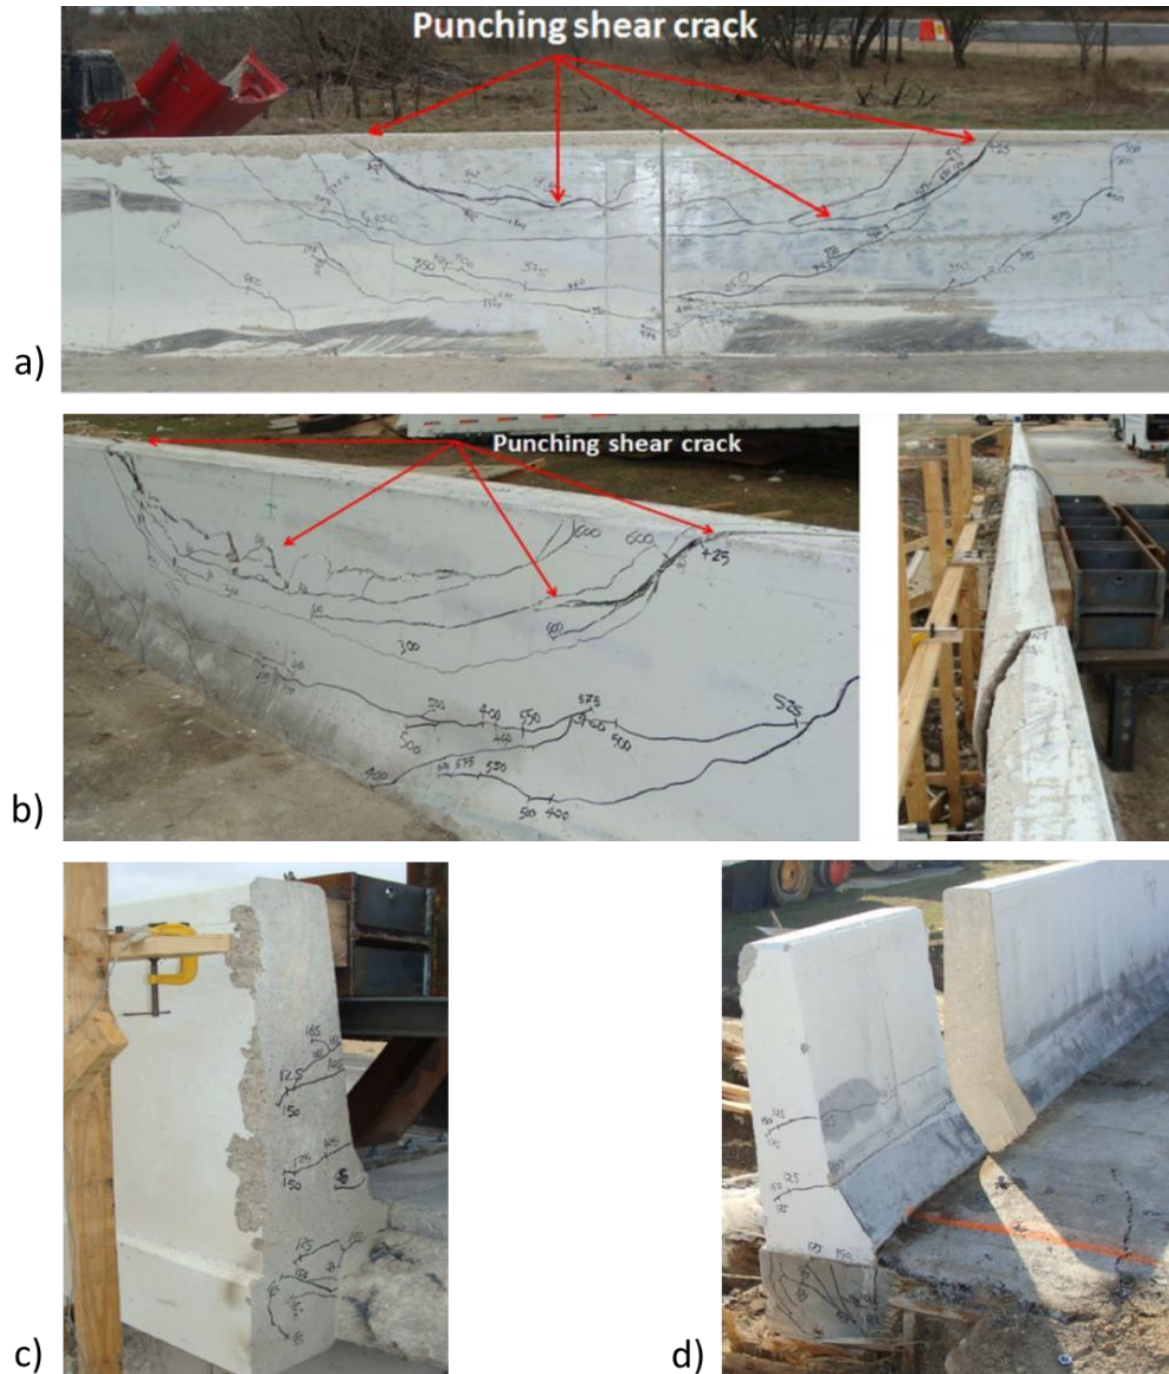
Details of the Tests 2-5: a) failure of the barriers loaded at expansion joint, b) front and top view of the crack pattern at ultimate load for the barrier loaded at middle, c) crack pattern at ultimate load at the section of the 39.4 in long barrier and deck system in the middle of the specimen, and d) failure of the 39.4 in long barrier and deck system at the end of the specimen [15].
